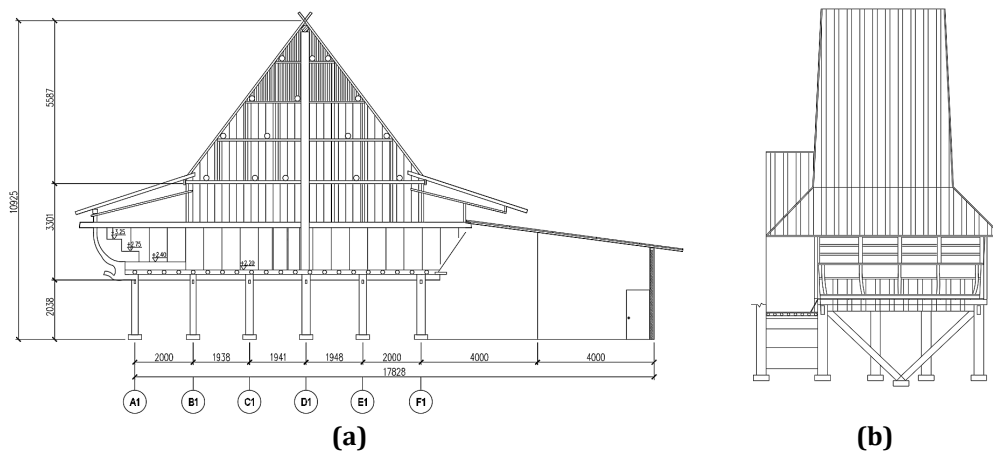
The traditional house in Bawomataluo Village (a) Front view; (b) Side view
